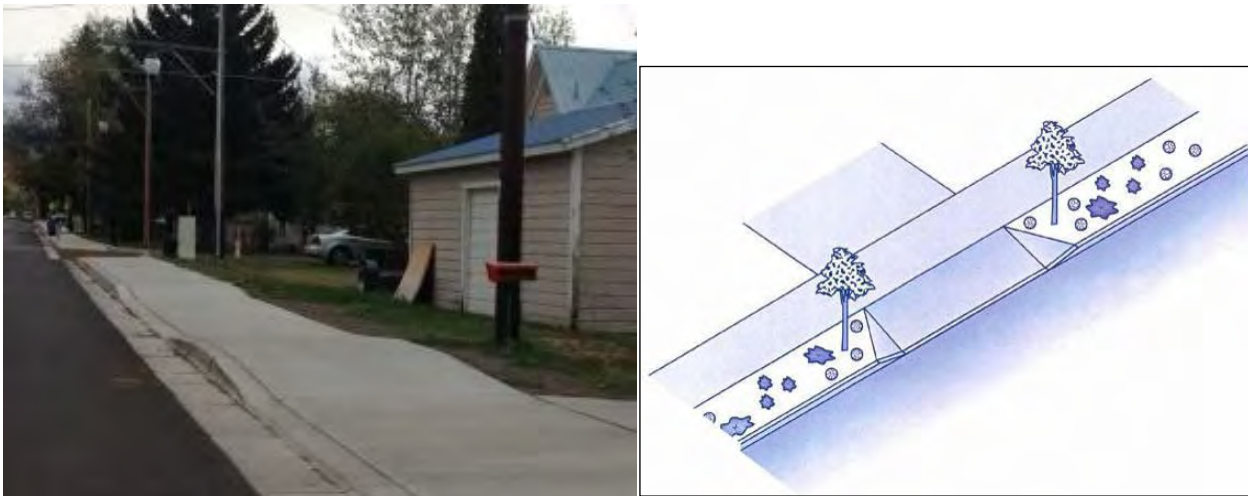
Existing sidewalks in Union dip at driveways, creating an uneven walking surface (left). Planter strips allow sidewalks to remain level, with the driveway grade change occurring within the planter strip (right).
